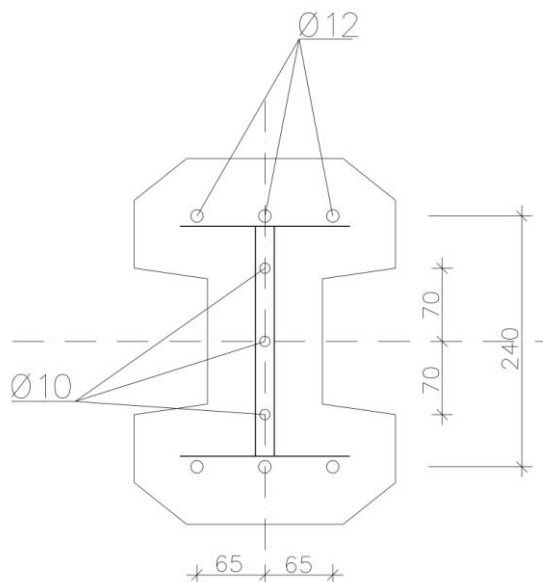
Arrangement of longitudinal bars and transverse shear reinforcement of reinforced concrete column
